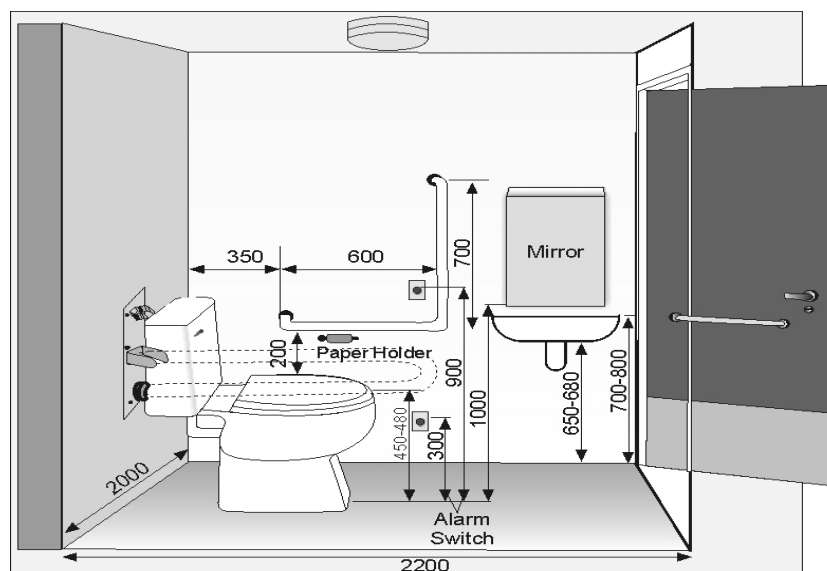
Plan of Accessible Toilet<sup>27</sup>
